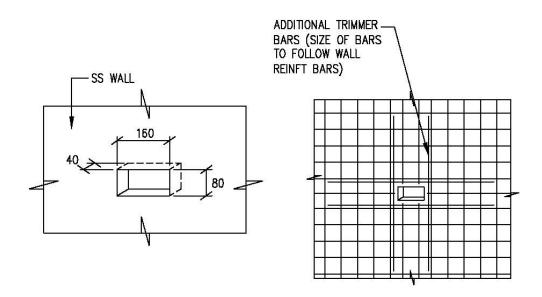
(e) TYPICAL DEATILS OF EMBEDDED CONDUIT IN SS WALL
